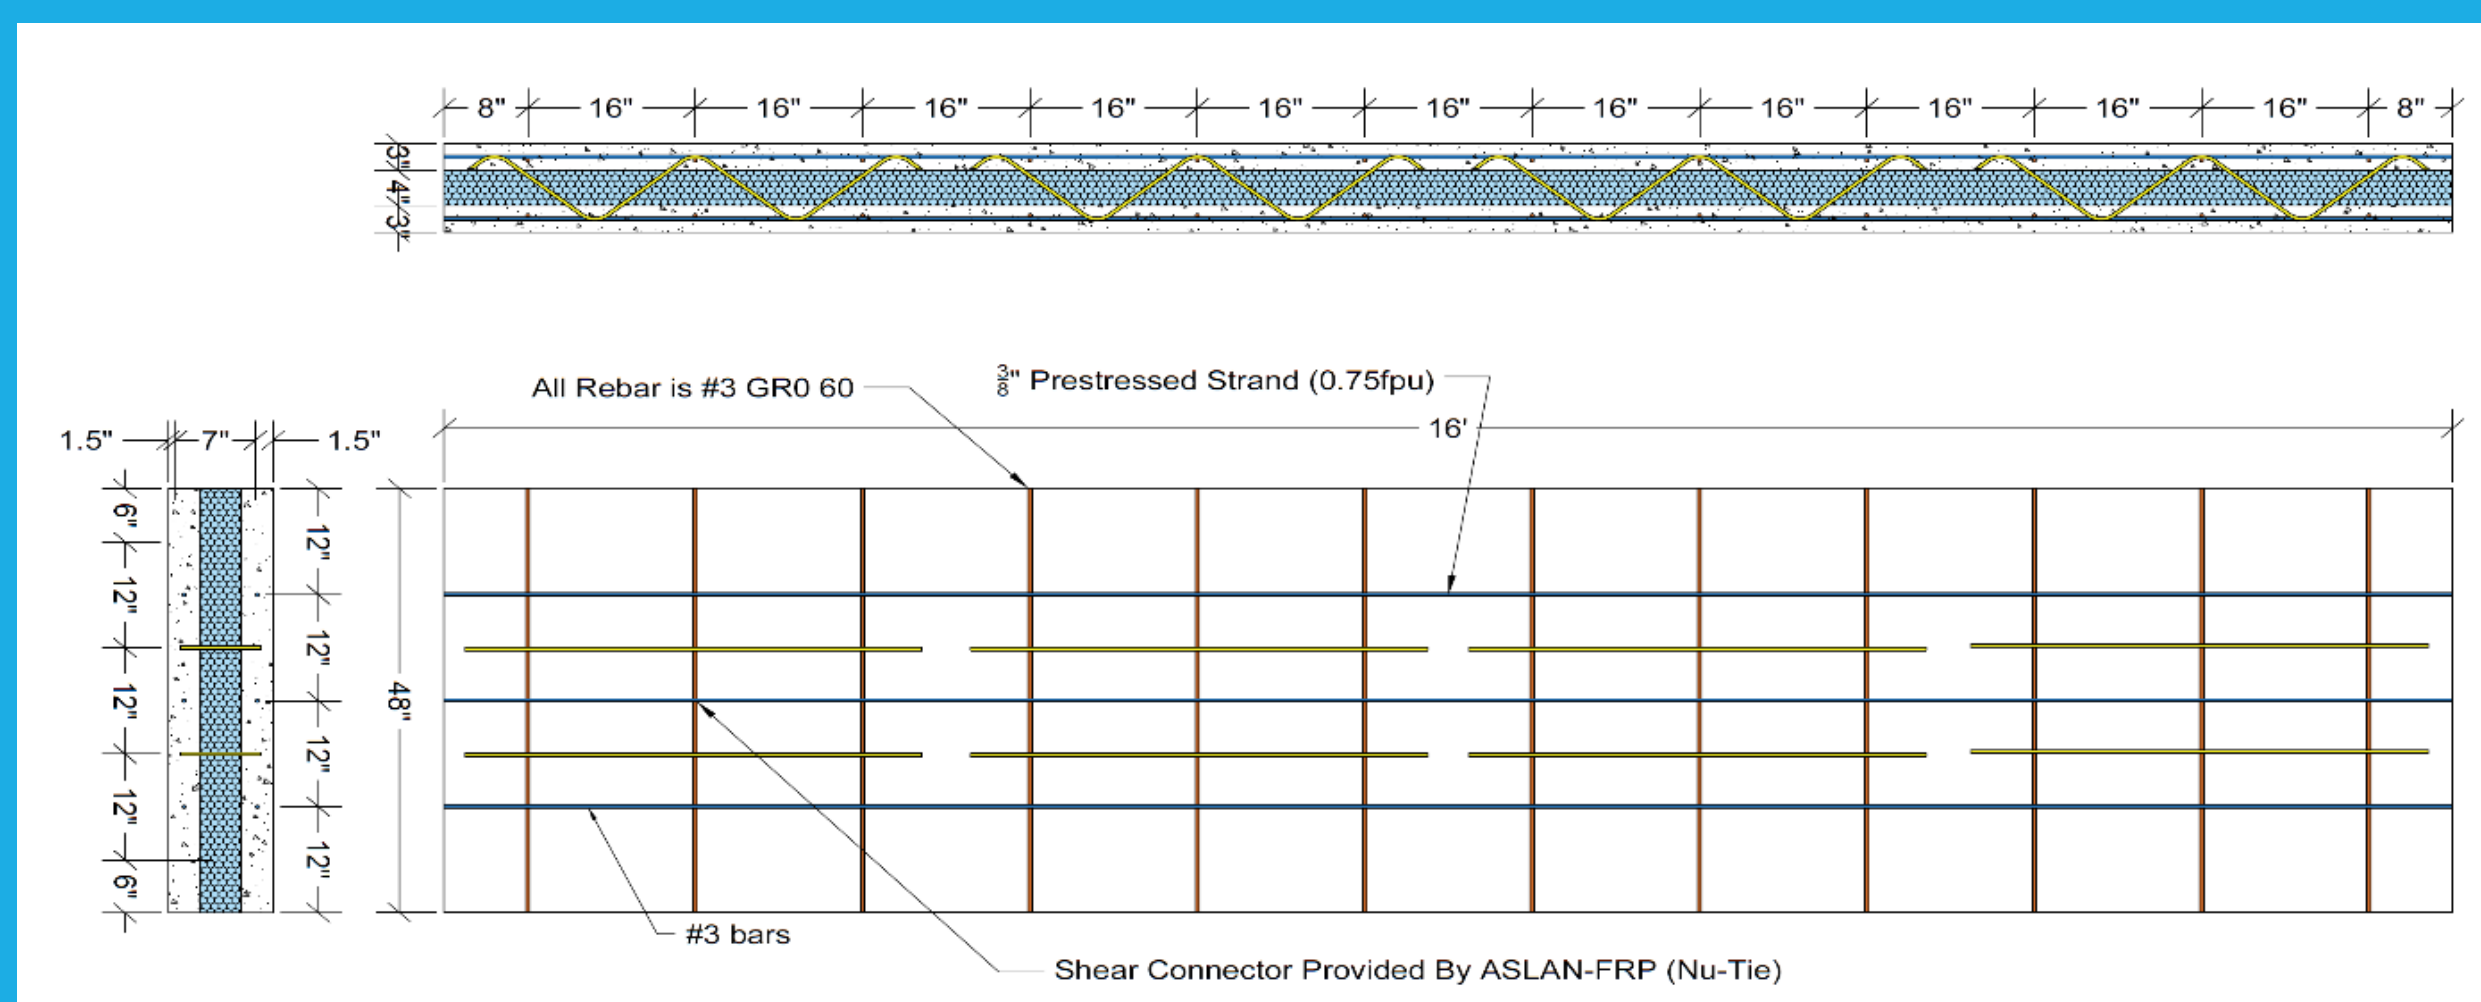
THiN Wall 343-2 Panel (connectors at lower level than recommended by manufacturer)
